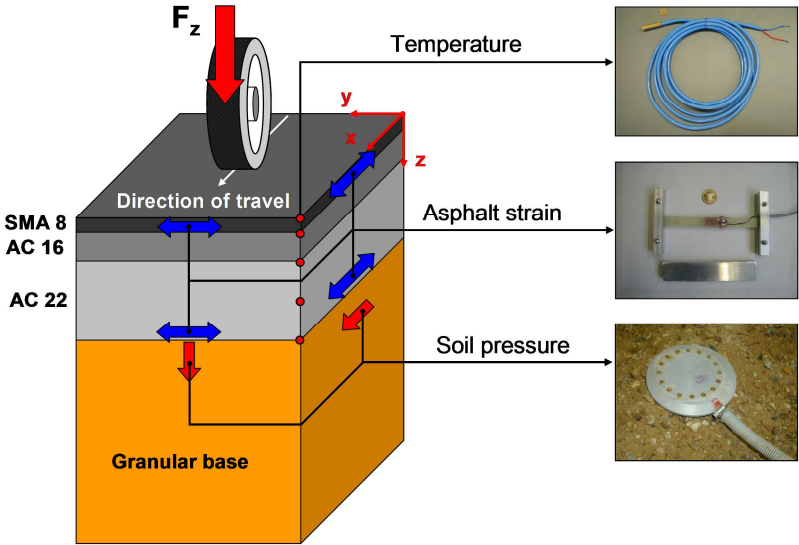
Sensor arrangement in the BAST full scale pavement test track (Rabe 2007).
